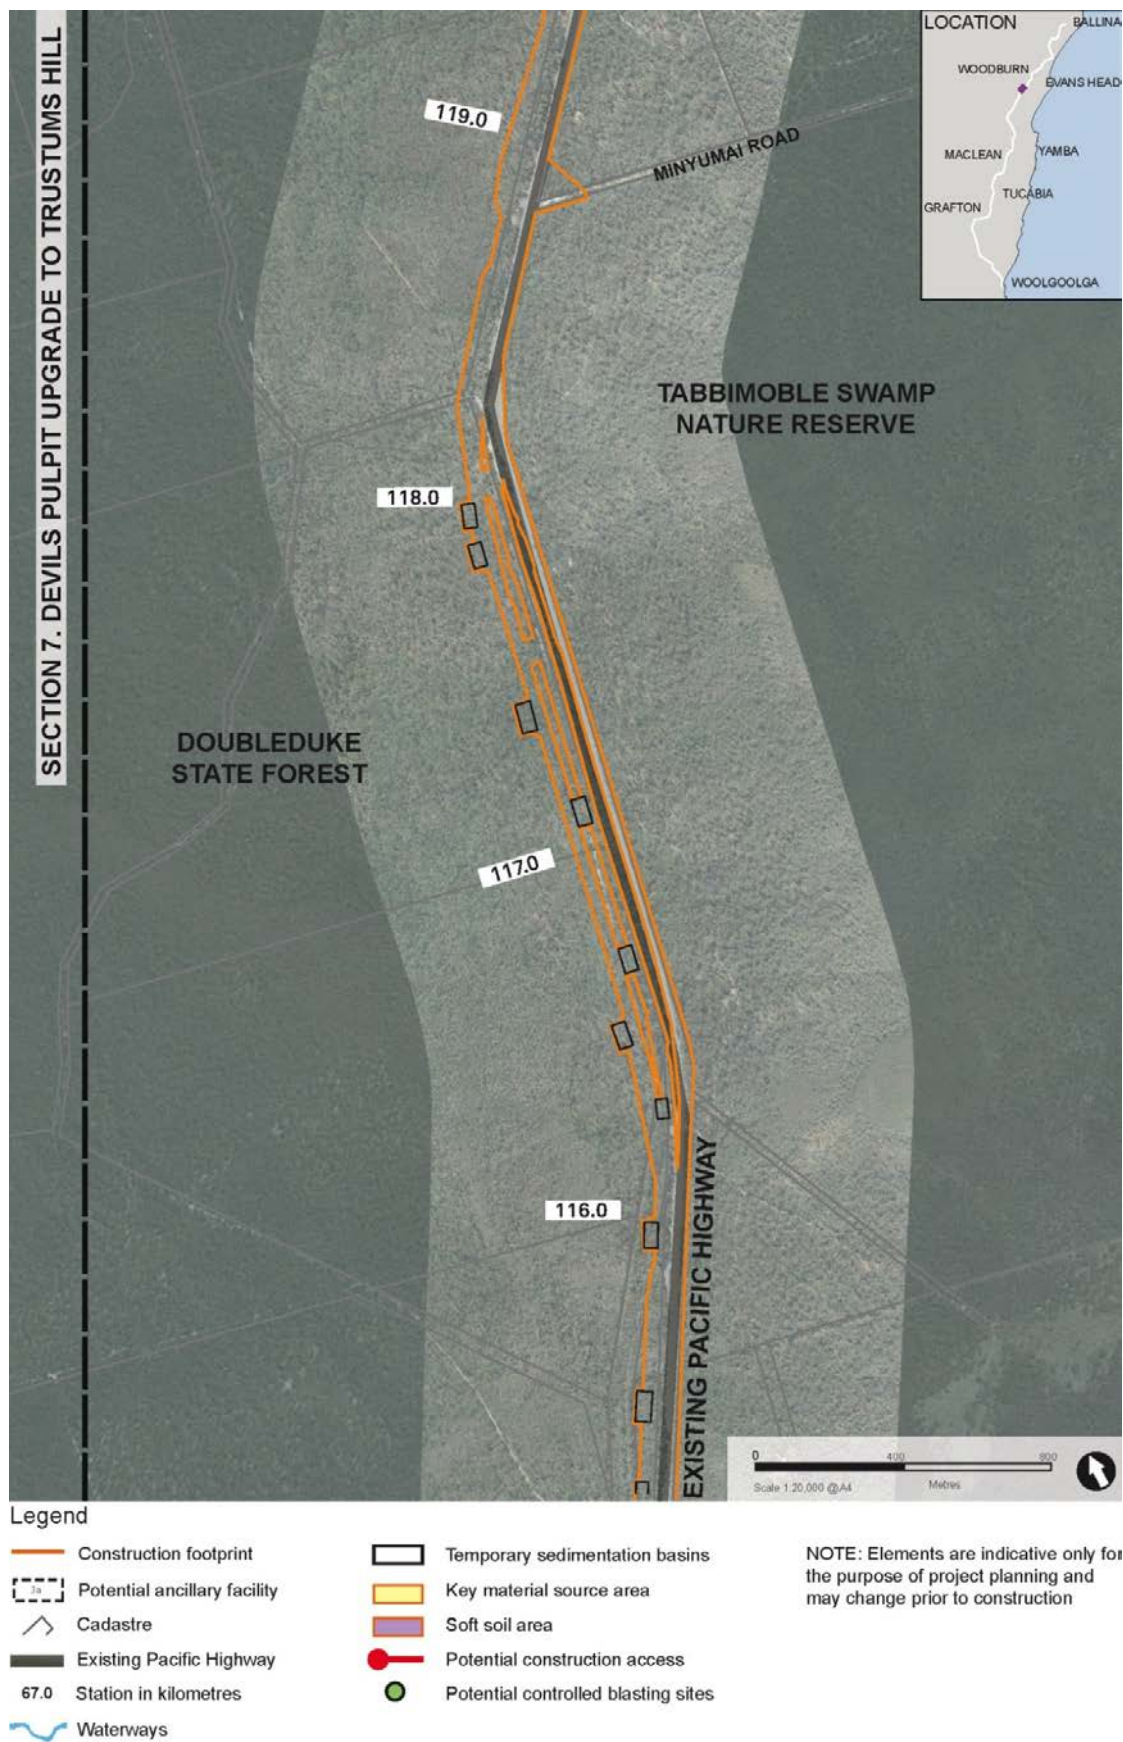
Extent of construction and construction features Section 7 (Station 115.3 to 119.3)
